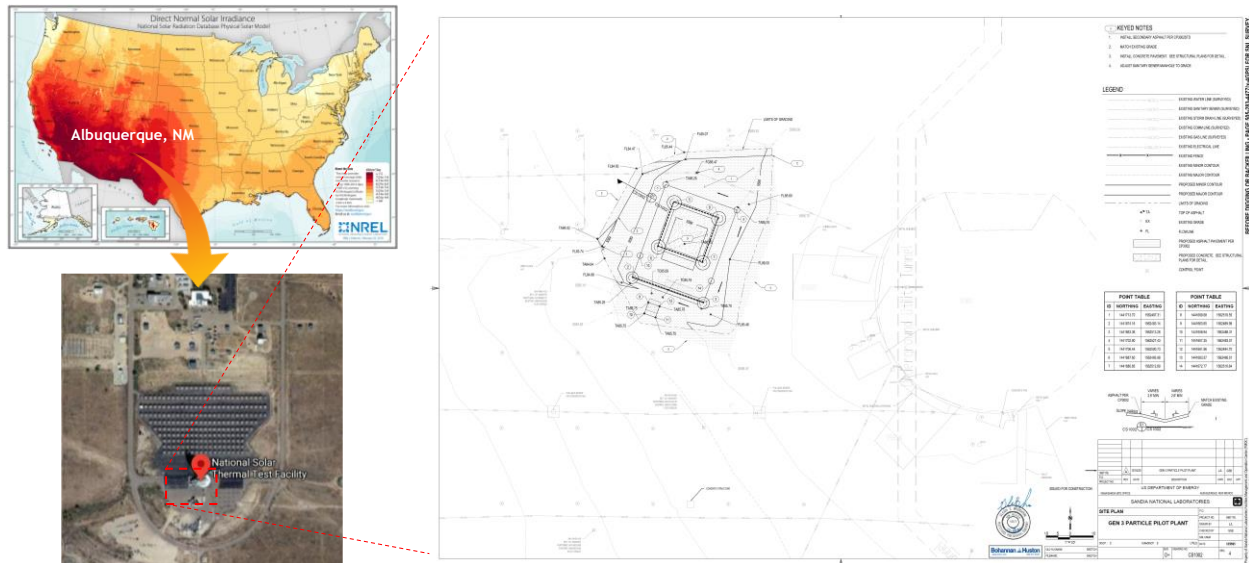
Proposed G3P3 tower immediately west of existing tower.
